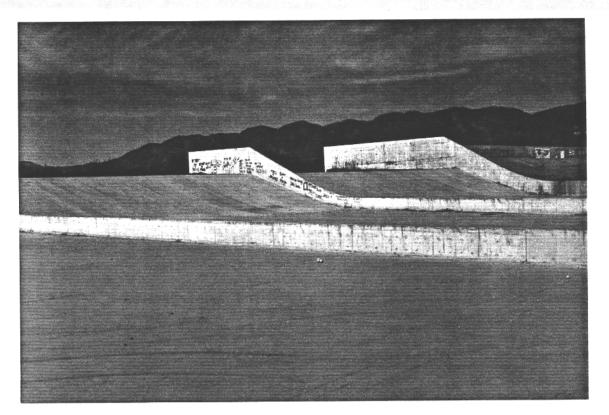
Lytle Creek East Branch Inlet Looking NE. On Right Is The Spillway Levee At Elev. 1160 Ft. Added Onto The Original Bypass Spillway When The East Branch Channel Was Modified. Top Of Levee Wall Is At Elevation 1160 Feet.
